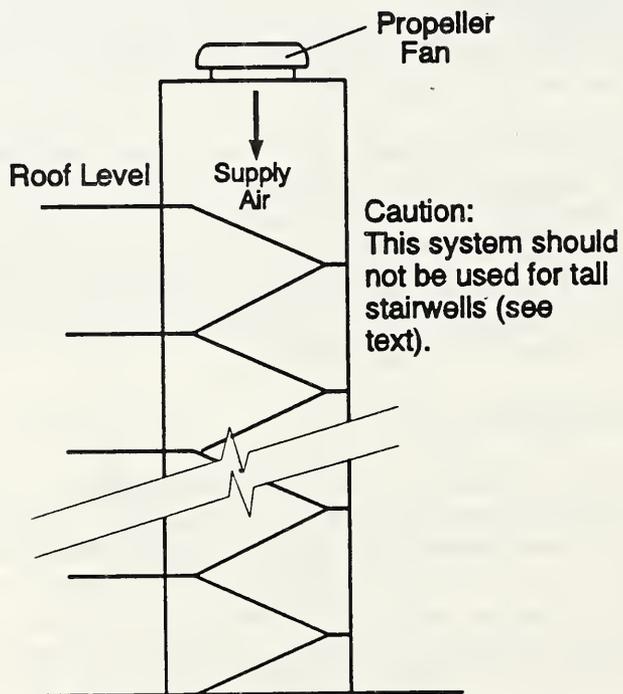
Stairwell pressurization by roof mounted propeller fan
